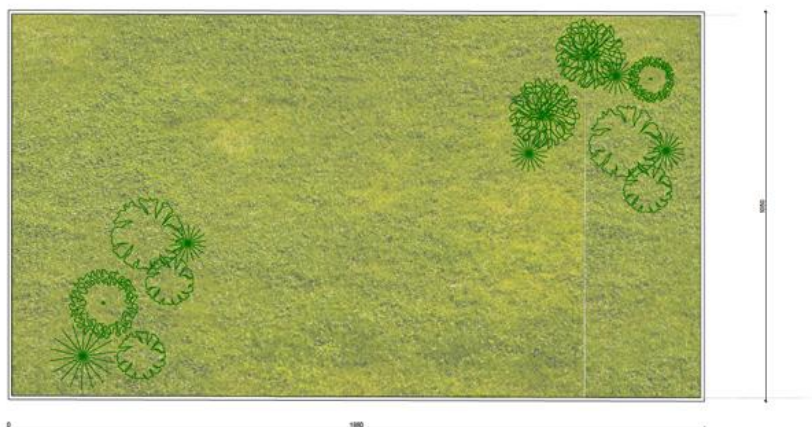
Eco-edu Hub in Park Usce. Roof plan view
